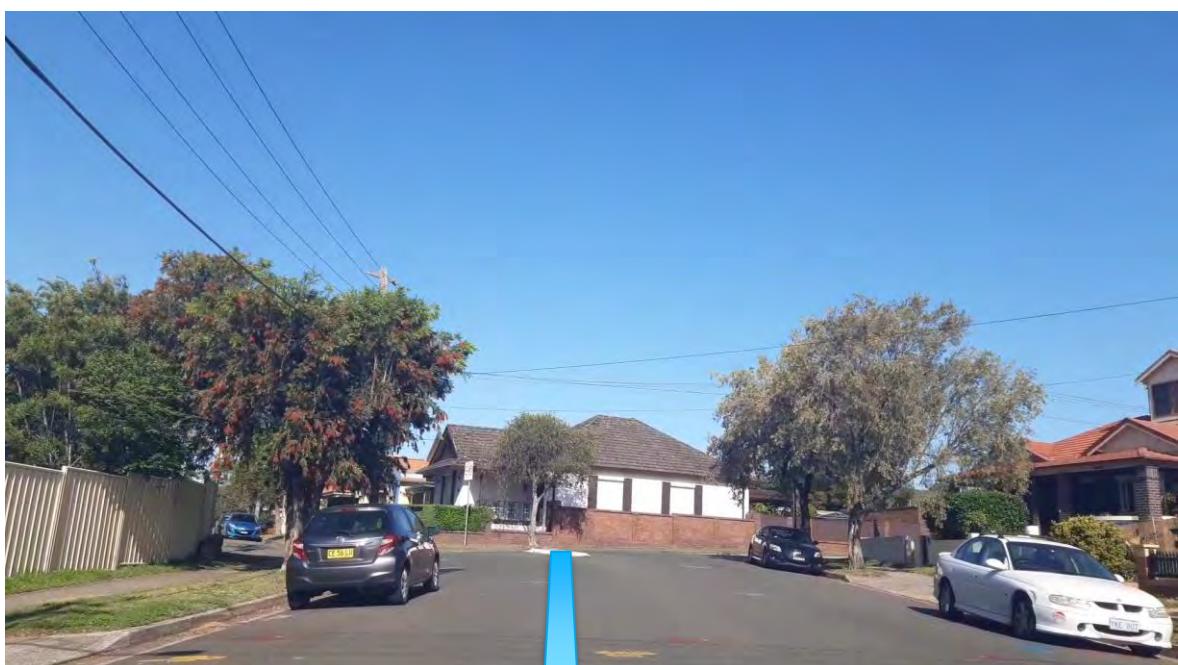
View at Cooks Ave (looking southwest towards High Street)
